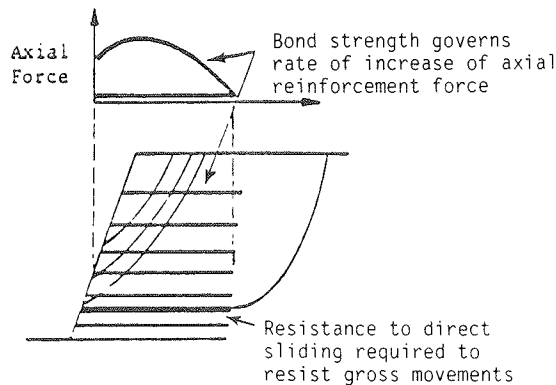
Failure by direct sliding along reinforcements. (Source: Ref. 4)
